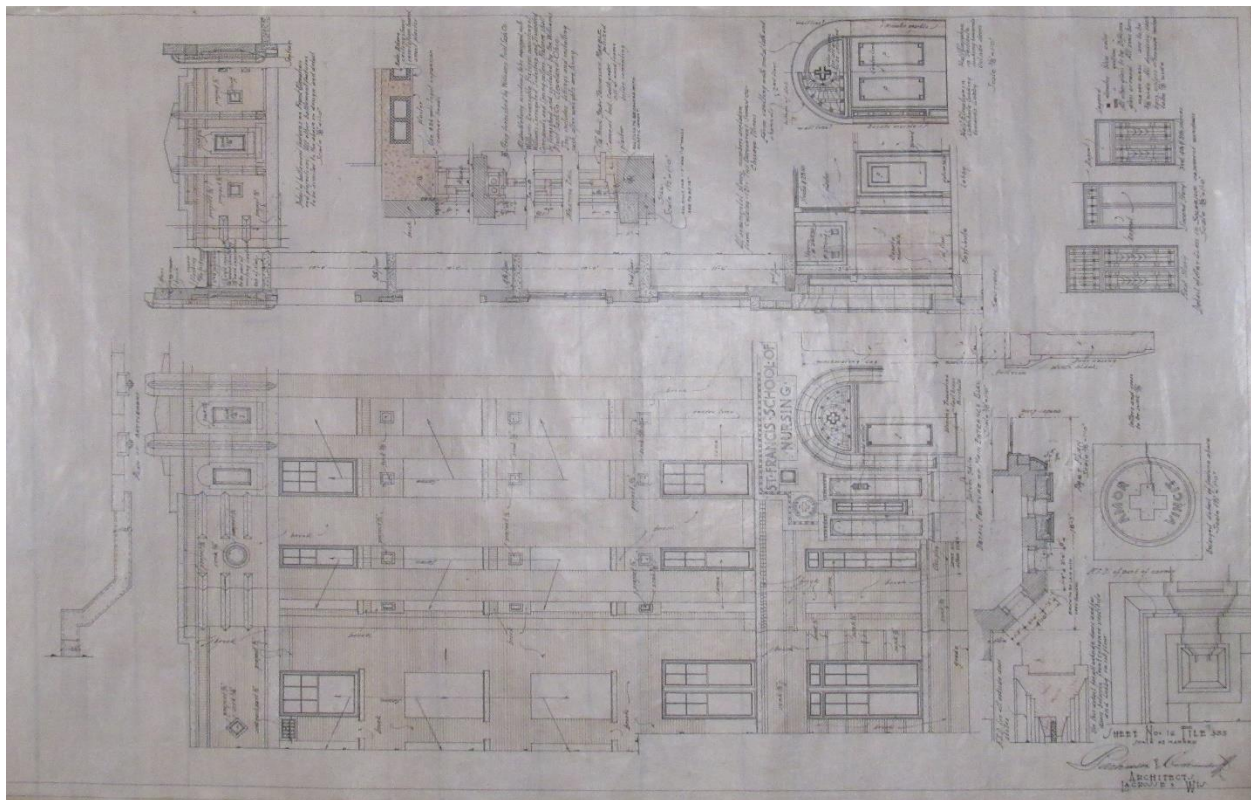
Original construction documents. “Facade Details” Sheet 16. 1 April 1941.
